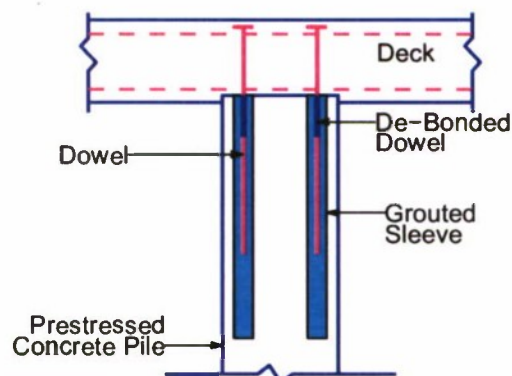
Dowel-connection between prestressed concrete pile and concrete deck.
